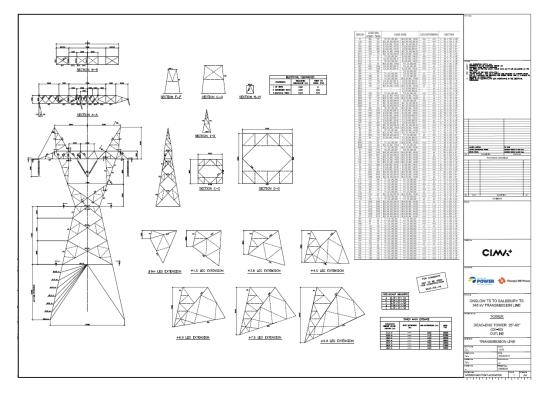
Example of an Angle/Dead-end Steel Lattice Tower Design
